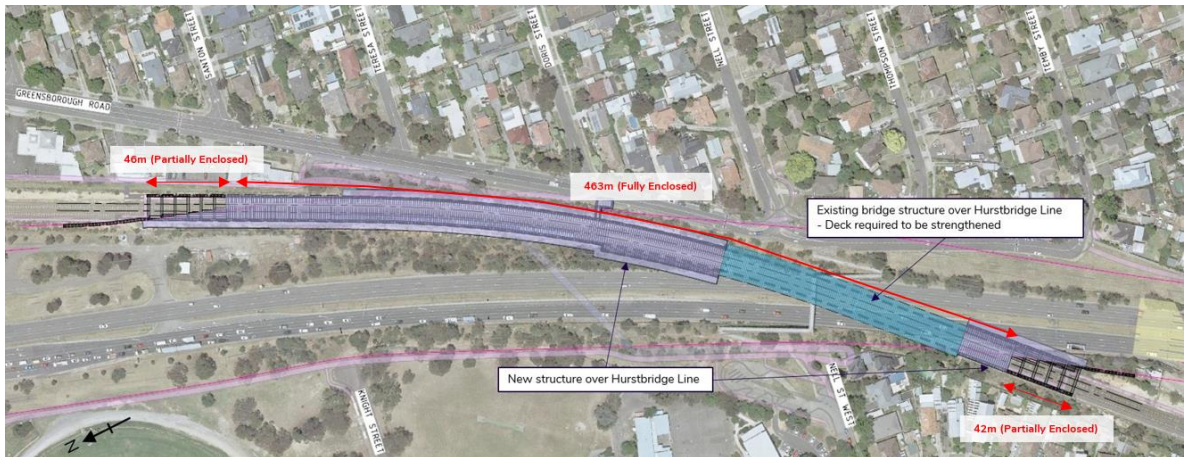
Greensborough Bypass Rail Tunnel Arrangement
